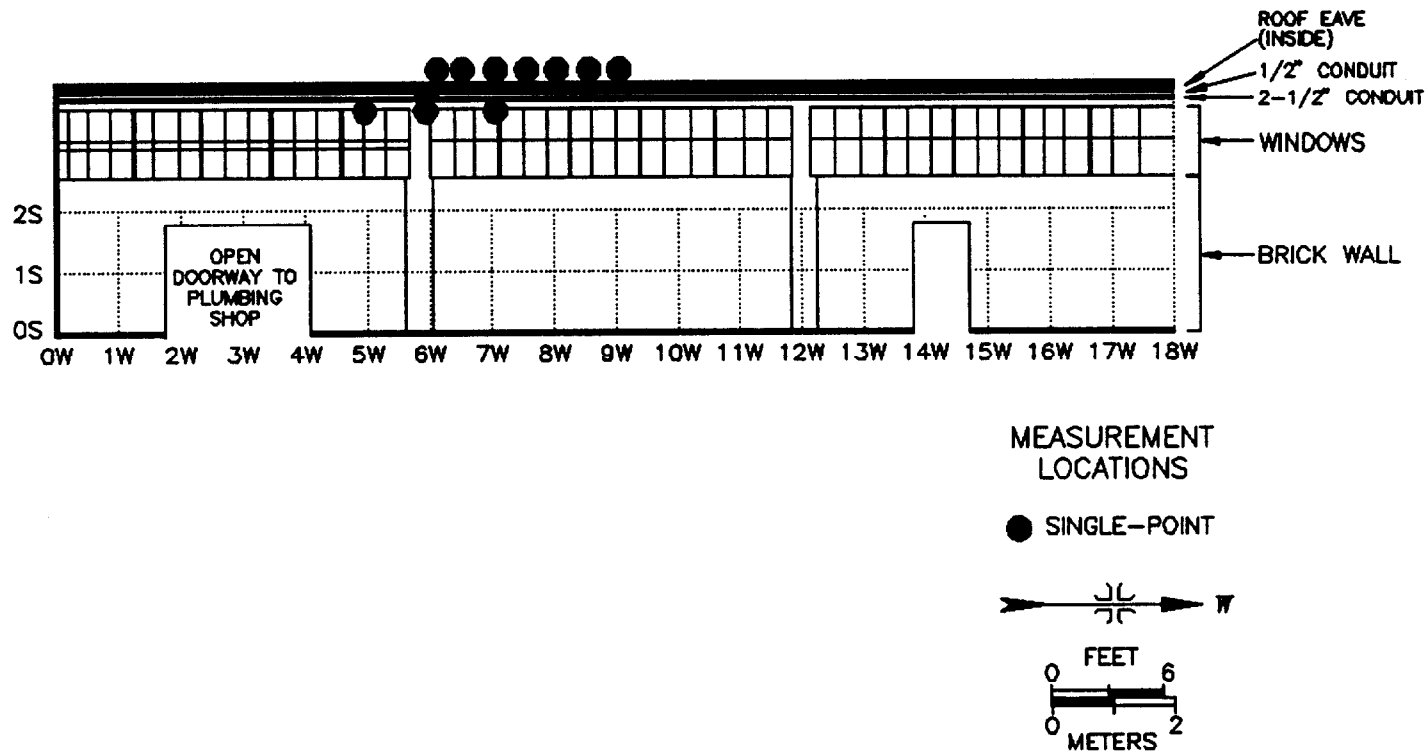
Building 5, Machine Shop, South Wall Conduits and Roof Eave – Measurement Locations
